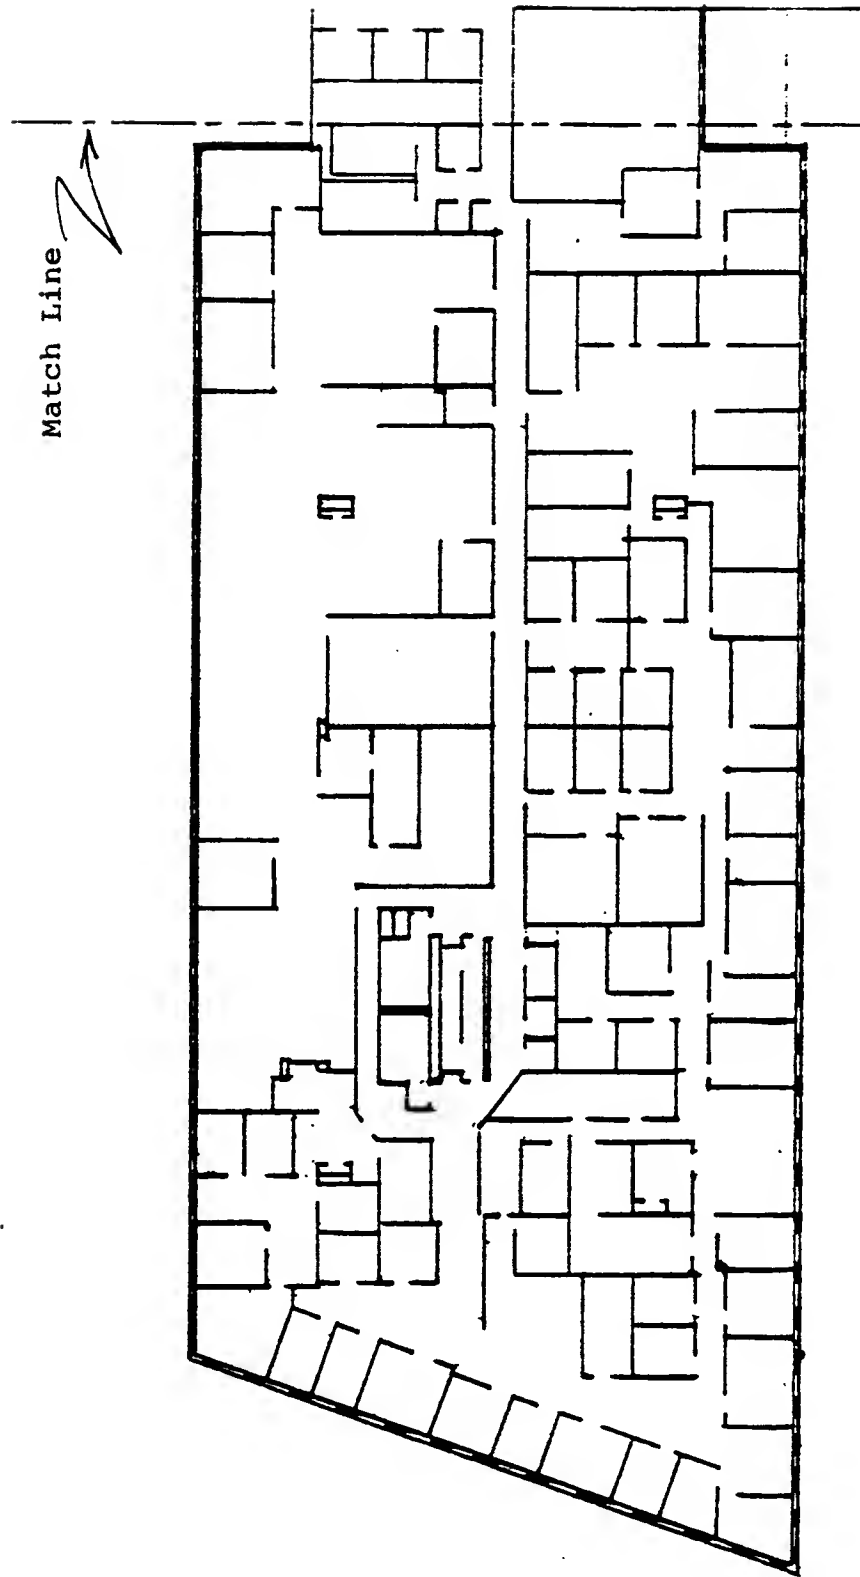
USIA BUILDING THIRD FLOOR-SOUTH
